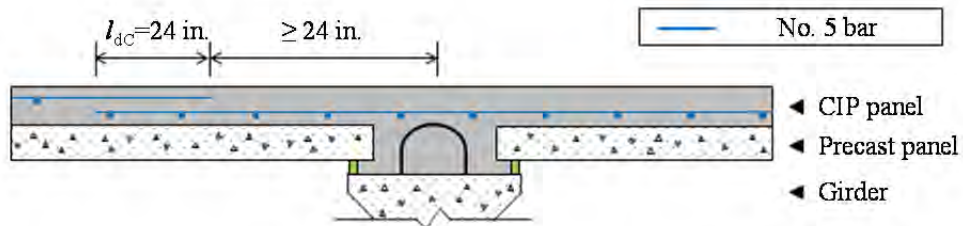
Details of transverse splices, Wharton-Weems Overpass (Section C-C)
